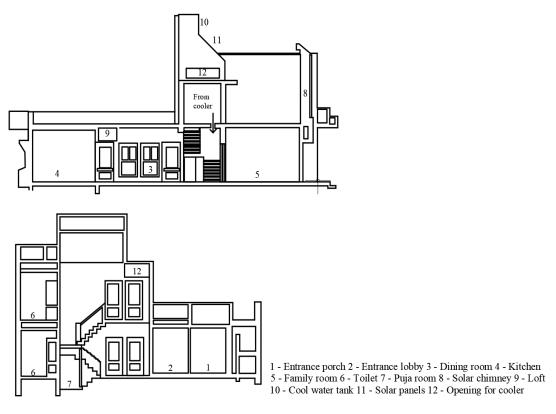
Building Section Displaying the Rooms' Centralized Evaporative Cooling System (Source: TERI Bookstore)
